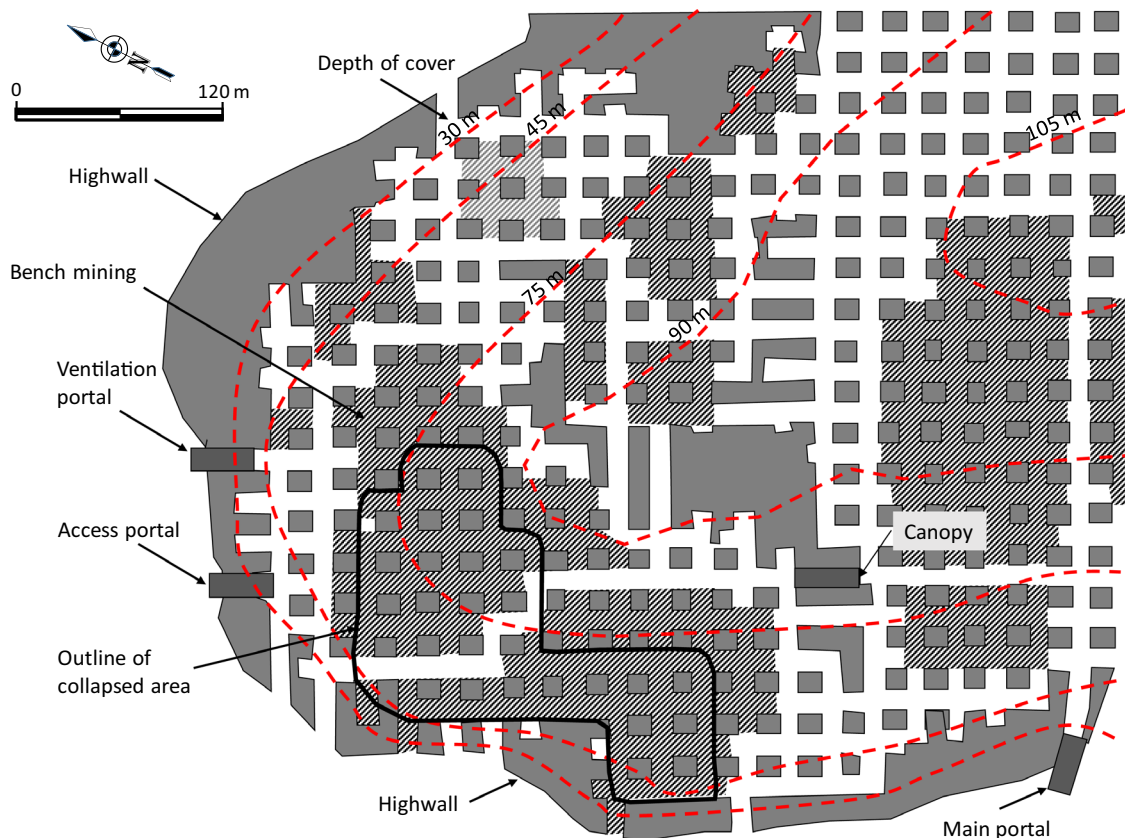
Plan view of the mine workings showing the room-and-pillar layout, the outline of the collapsed area and depth of cover contours
